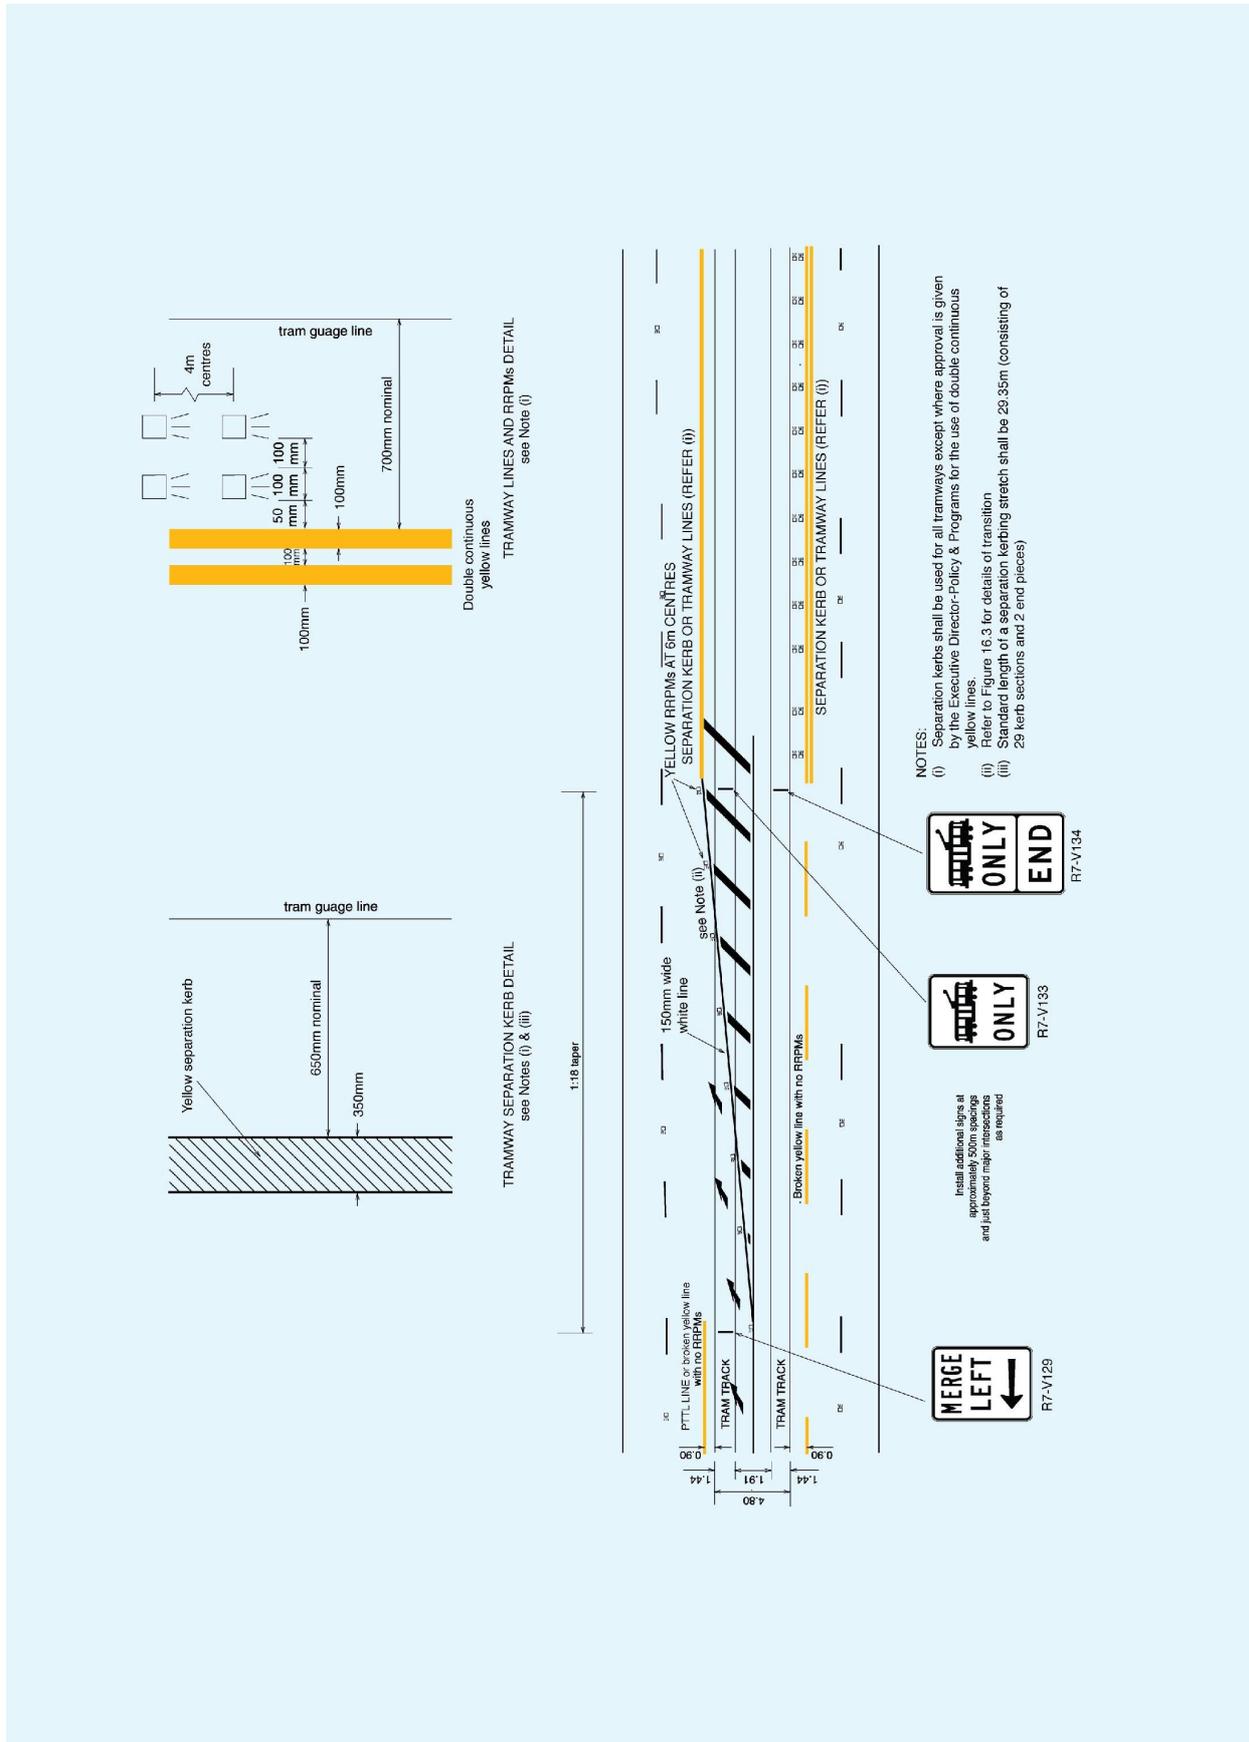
Typical layout for separation kerbing, linemarking and RRPMs of a tramway
